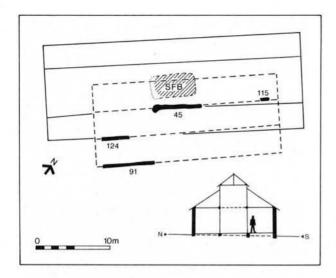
Reconstructed plan (broken line) and schematic section of Building 2 in relationship to Building 3 (solid line) and sunken-floored building (SFB)
